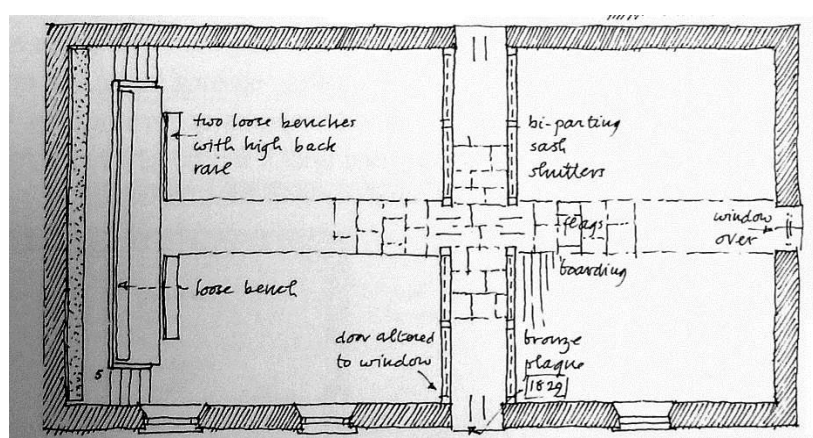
Example of a larger meeting house: St Austell Meeting House, Cornwall, 1829. Ground floor plan (not to scale) (Butler, vol. 1, p. 71)
